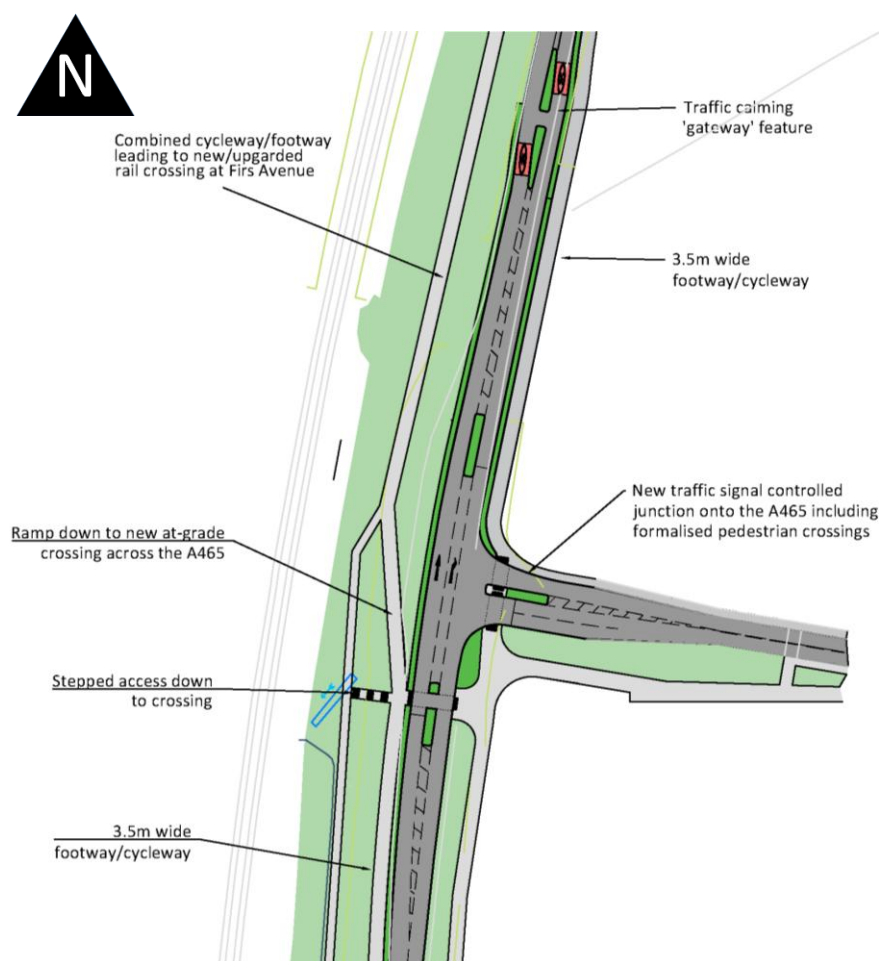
New at-grade crossing across the A465 to access the existing rail crossing at Firs Avenue
